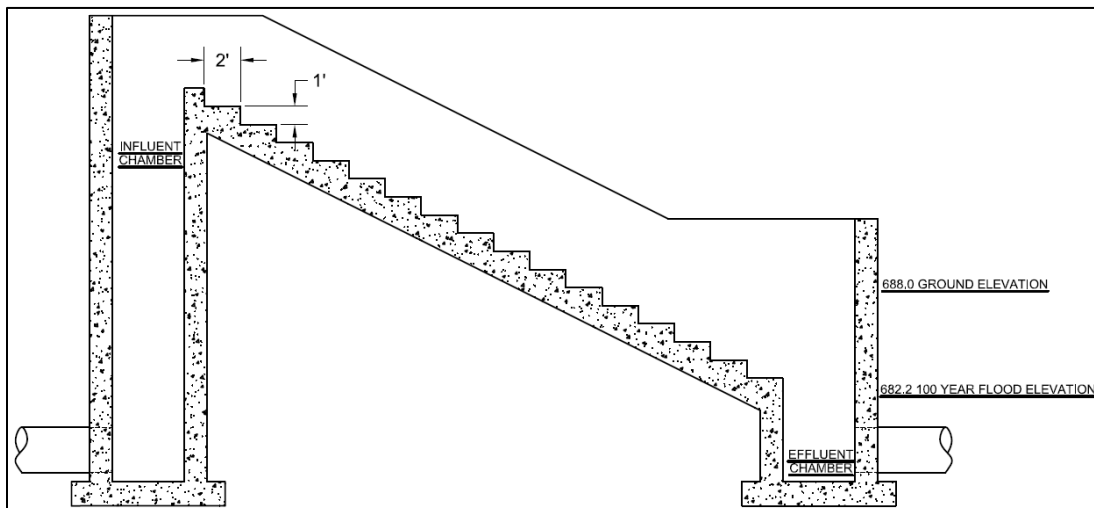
Cross Section of Concrete Step Cascade Reaeration
